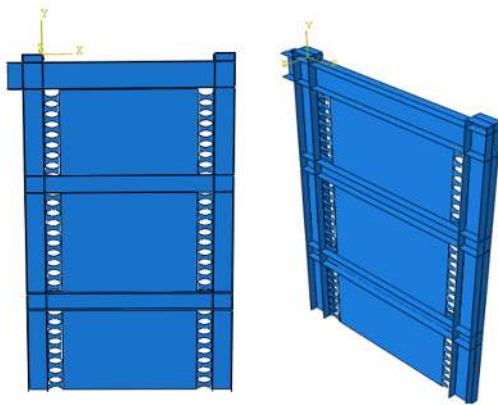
Finite element model of steel shear wall equipped with ADAS dampers
